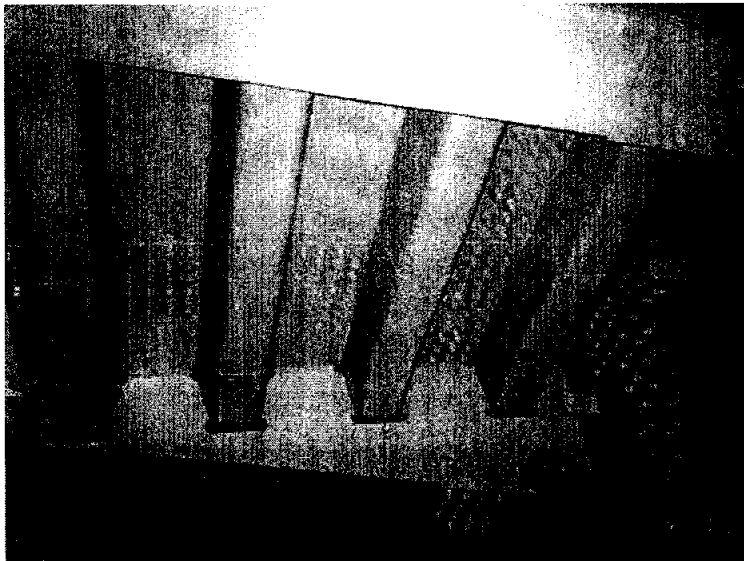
Front View of Field Welded Joint of U Rib
